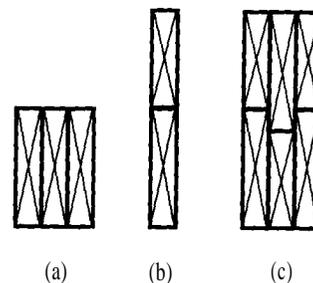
Cross-sections for typical (a) laminated column, (b) stacked beam, and (c) built-up girder.
